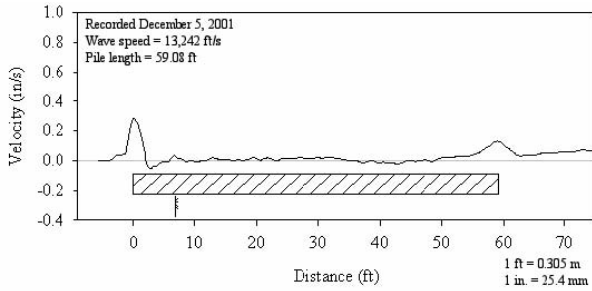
PIT sounding on the prestressed concrete test pile before installation (from Pando et al. (2006))
